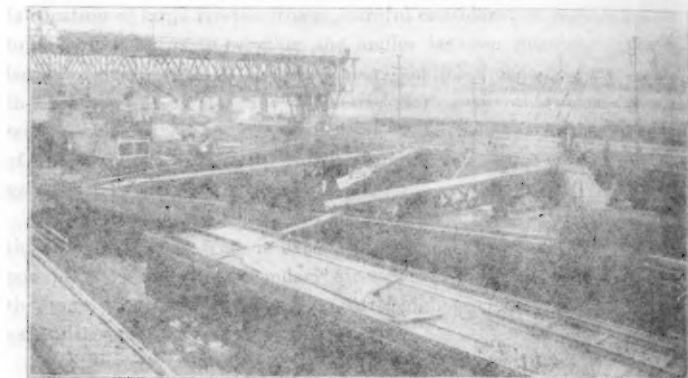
Assembling Arch Trusses at Shop for Hill Gate Bridge.
